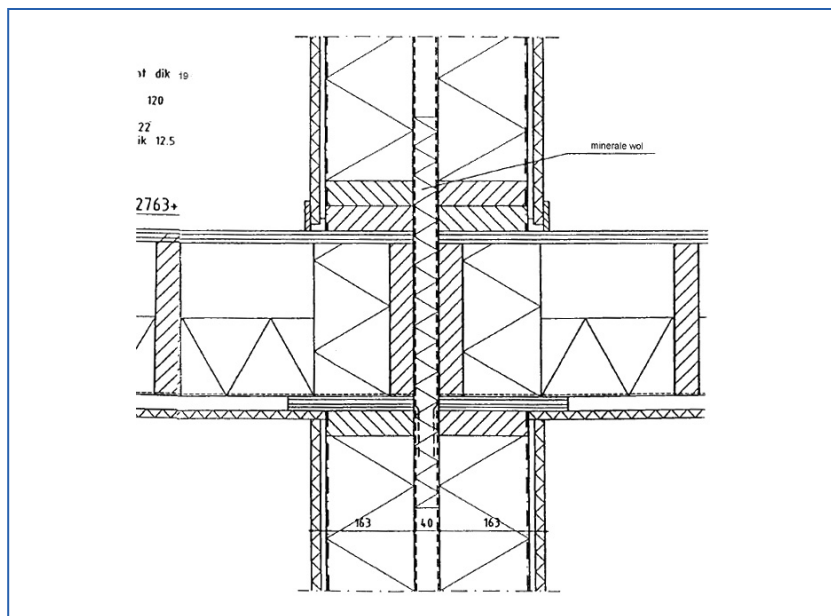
Timber Based building with cavities of 200 to 300 mm:
